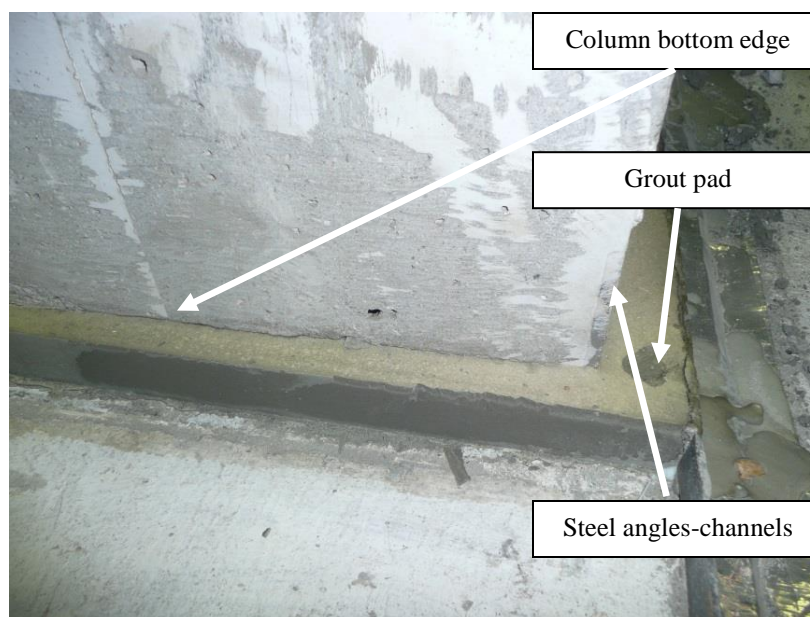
Grouting surrounds the bottom edge of the rocking column
